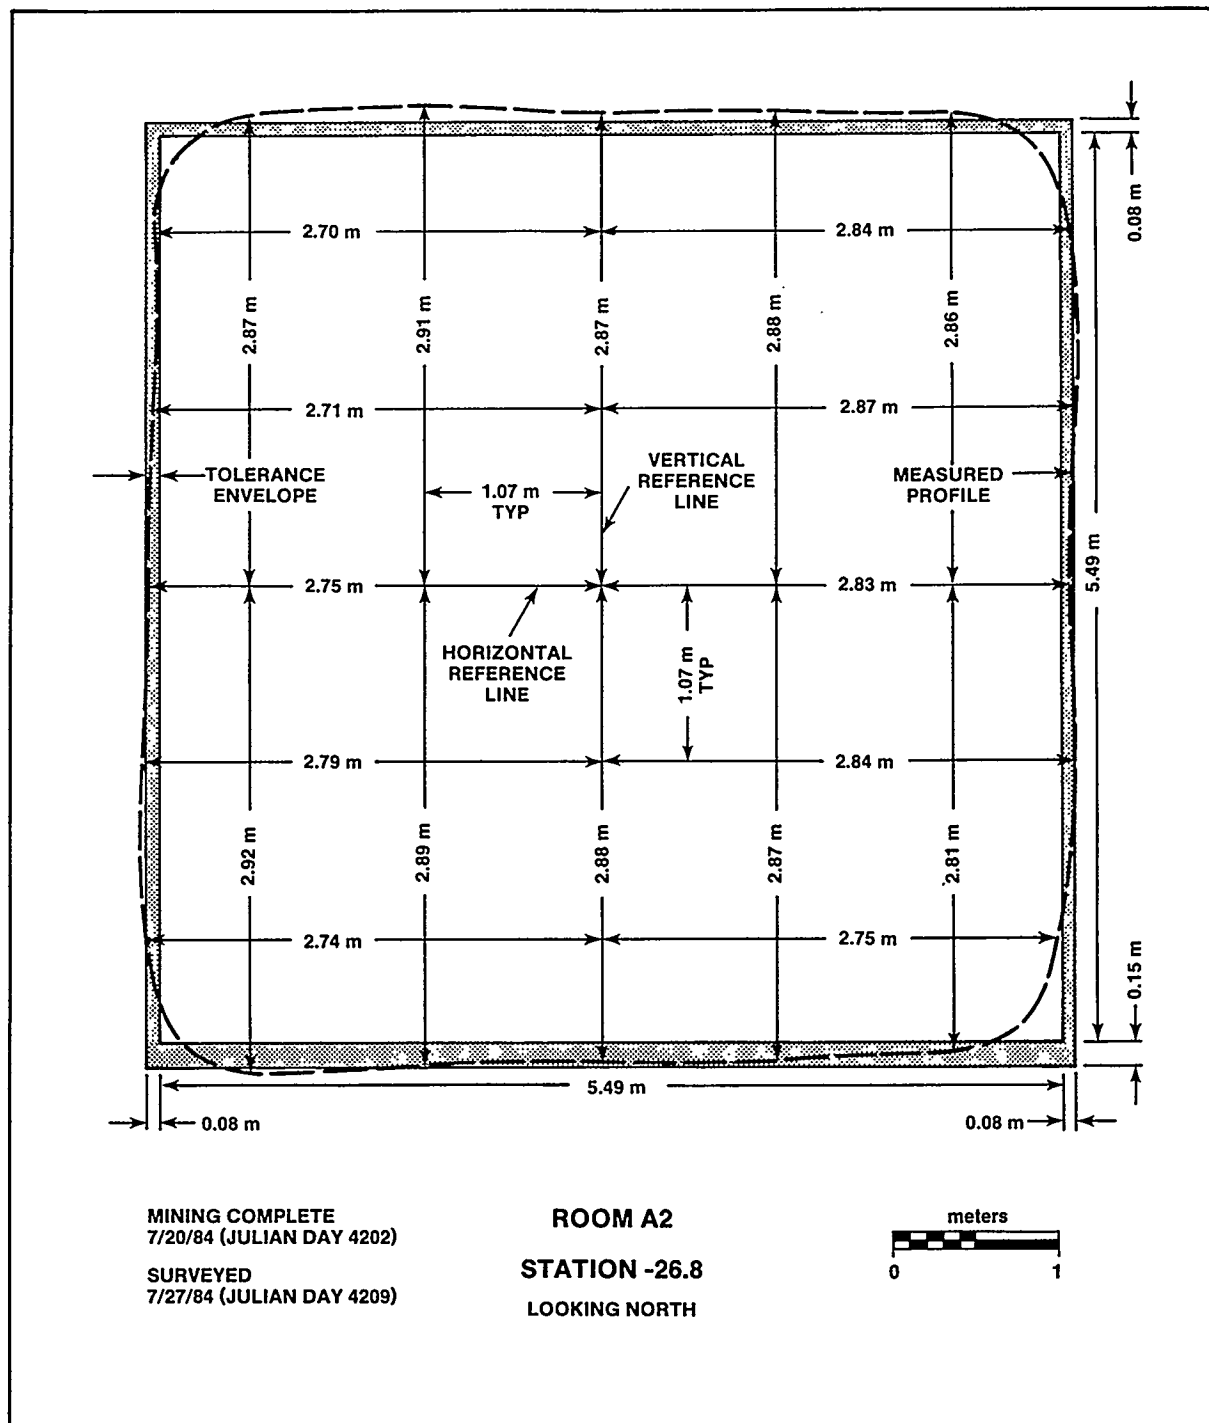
As-Built Cross Section of Station -26.8 m, Room A2
